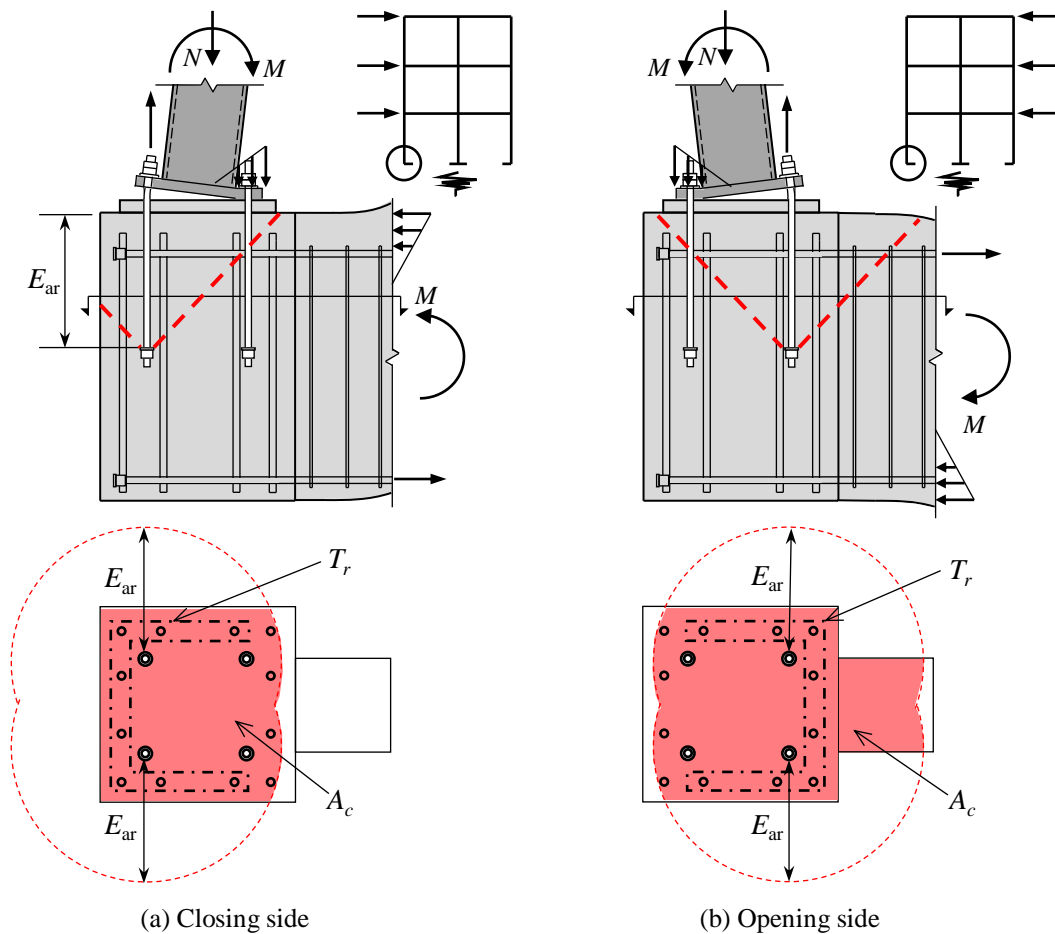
Calculation method of pull-out strength of anchor rods owing to the concrete breakout failure [3-1]
